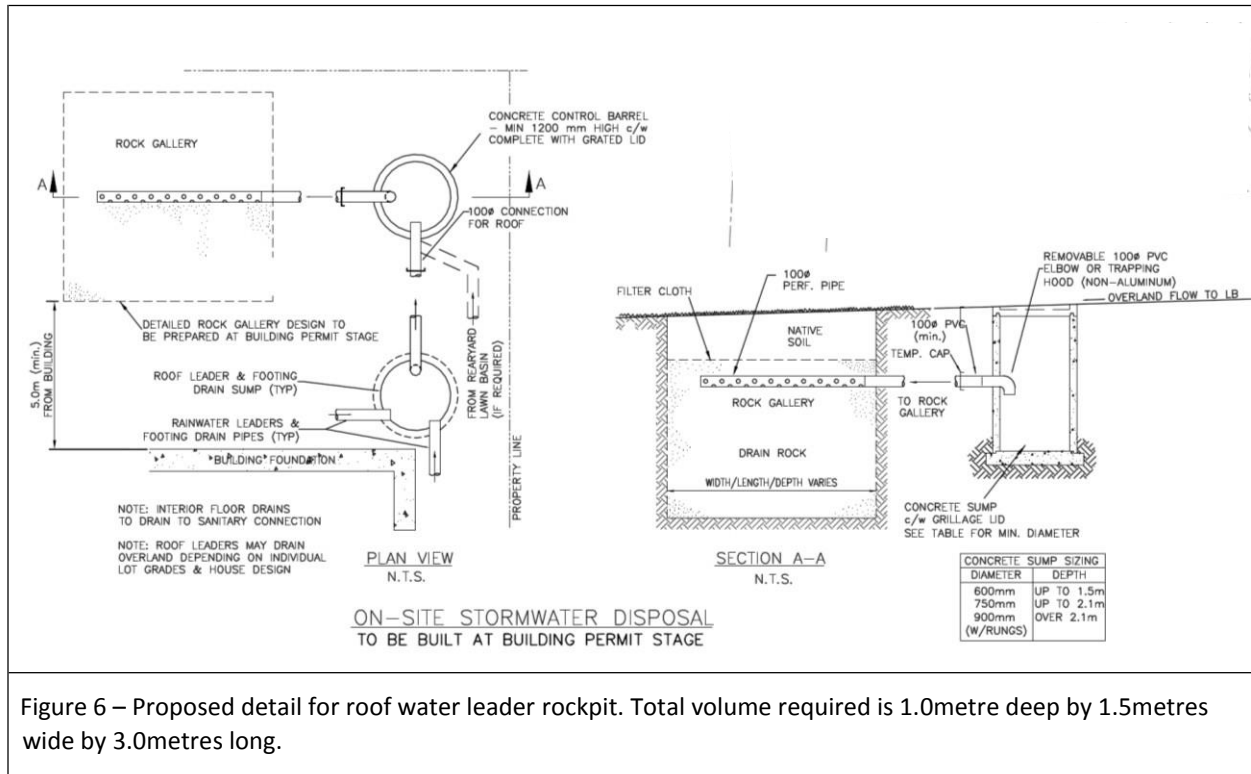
Proposed detail for roof water leader rockpit. Total volume required is 1.0metre deep by 1.5metres wide by 3.0metres long.
